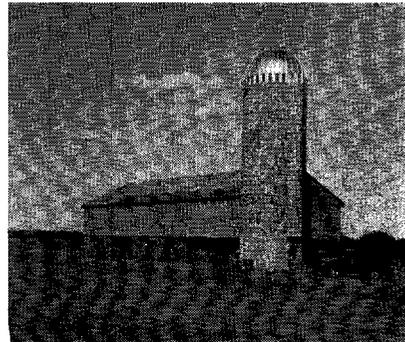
A hay barn, 96 by 40 feet, was built during the spring of 1960 at a cost of \$6,000. "A cement stave silo, 16 by 50 feet, was placed at the south end adjacent to the hay shed. It constituted one of four silos planned for a new dairy unit."
